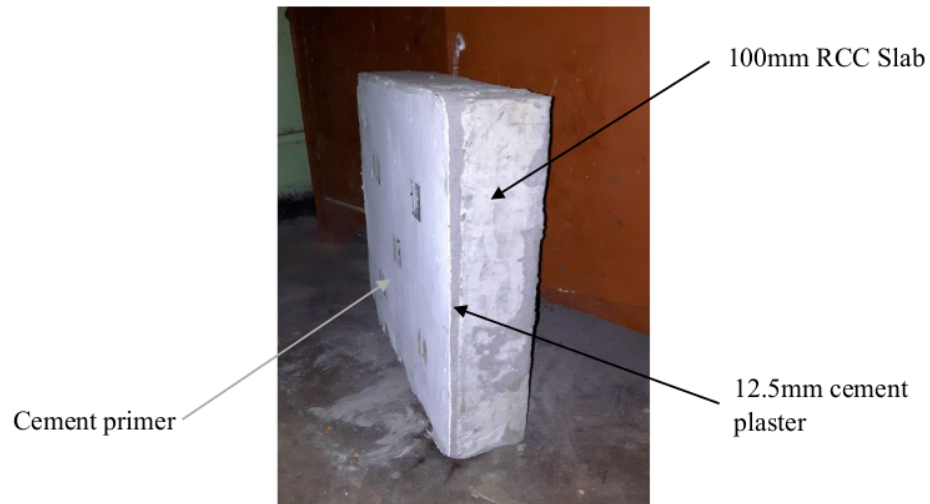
Side view of the RCC roof slab (Sample WIV).
